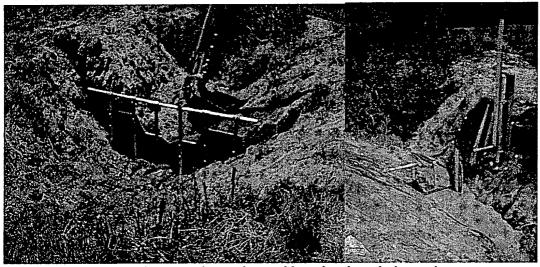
At the central stream site, a plywood board and steel pipe weir was constructed and pushed into the ground with a backhoe. The backhoe can also remove the structure by pulling up on cables attached to the pipes.
